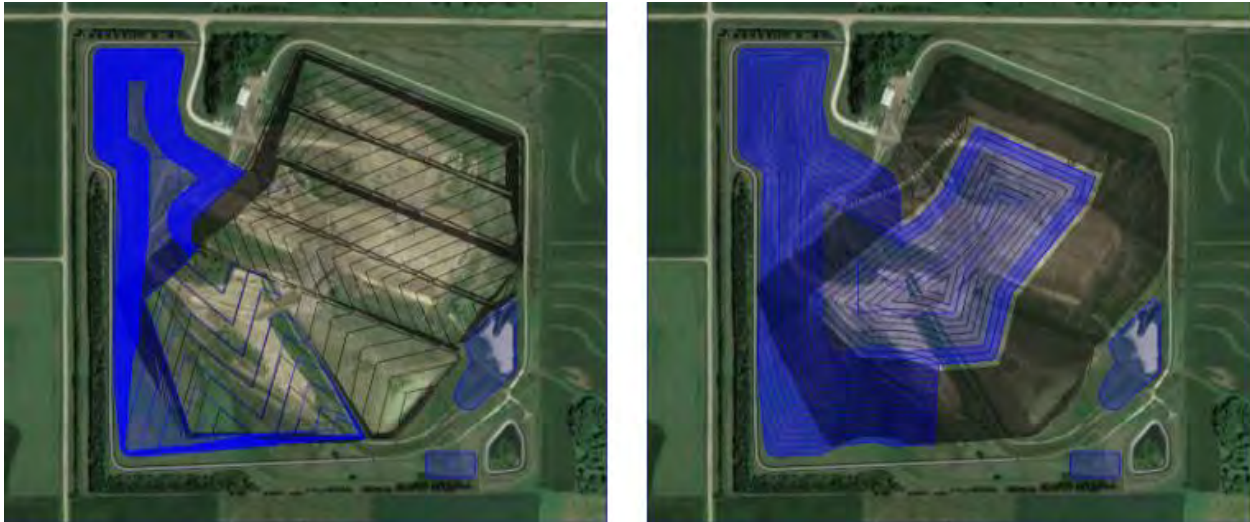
NNSWC Expansion Alternative 1 Base Grades (left) and Final Cover (right)
